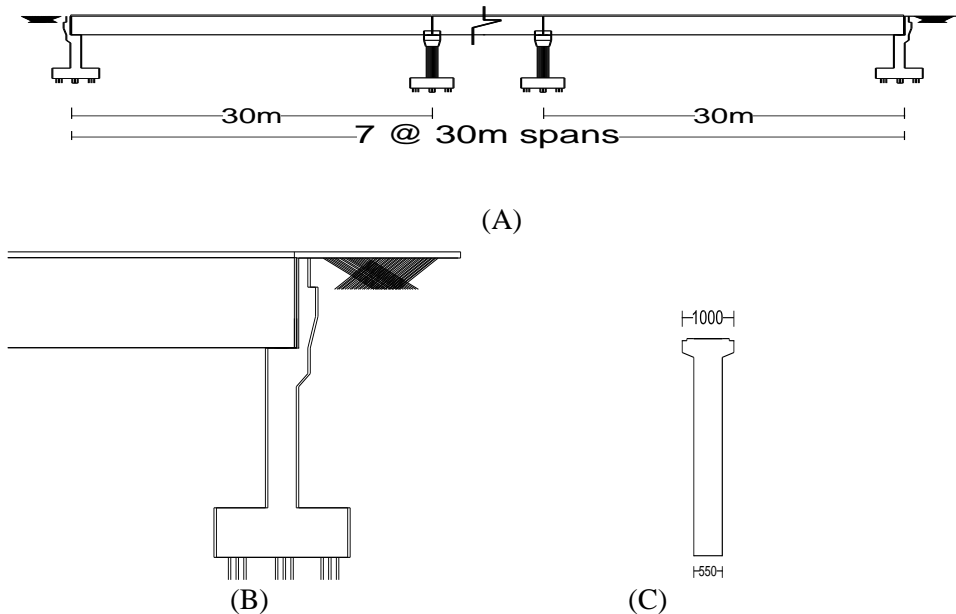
(A) Elevation of the 210m long bridge. (B) Girder abutment integral connection. (C) Posttensioned T-beam (Dimensions in mm).
